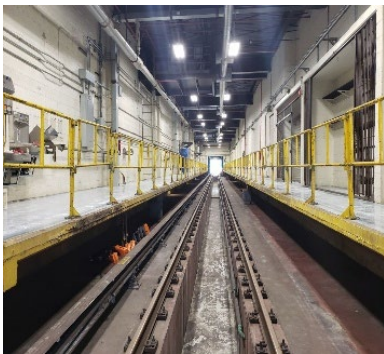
SHOP EQUIPMENT EXAMPLES
